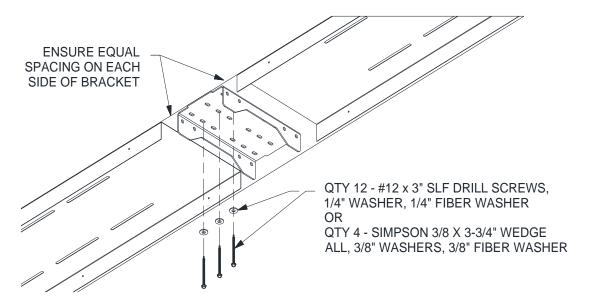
Upper Shaft Support attachment to lintel (bottom view)
